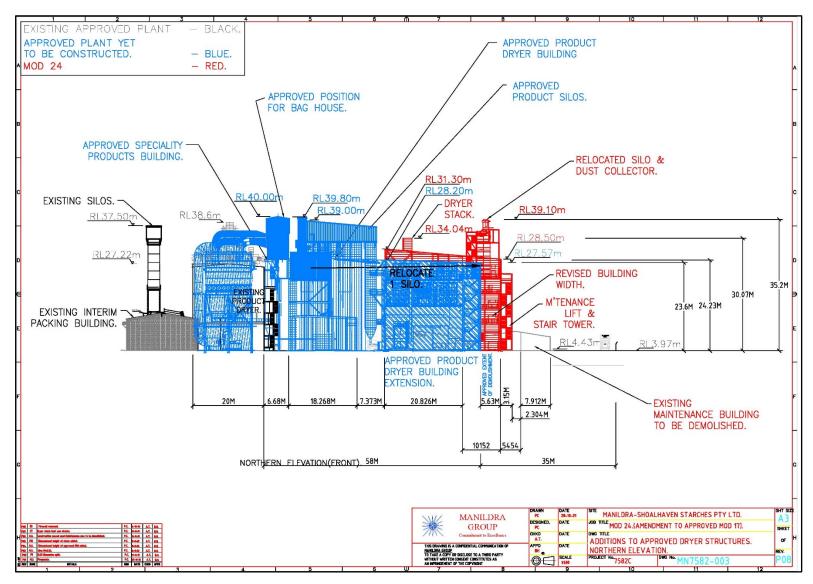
Elevation details (northern) of proposed modification to GD8 Building and relocation of silo and associated dust collectors.
